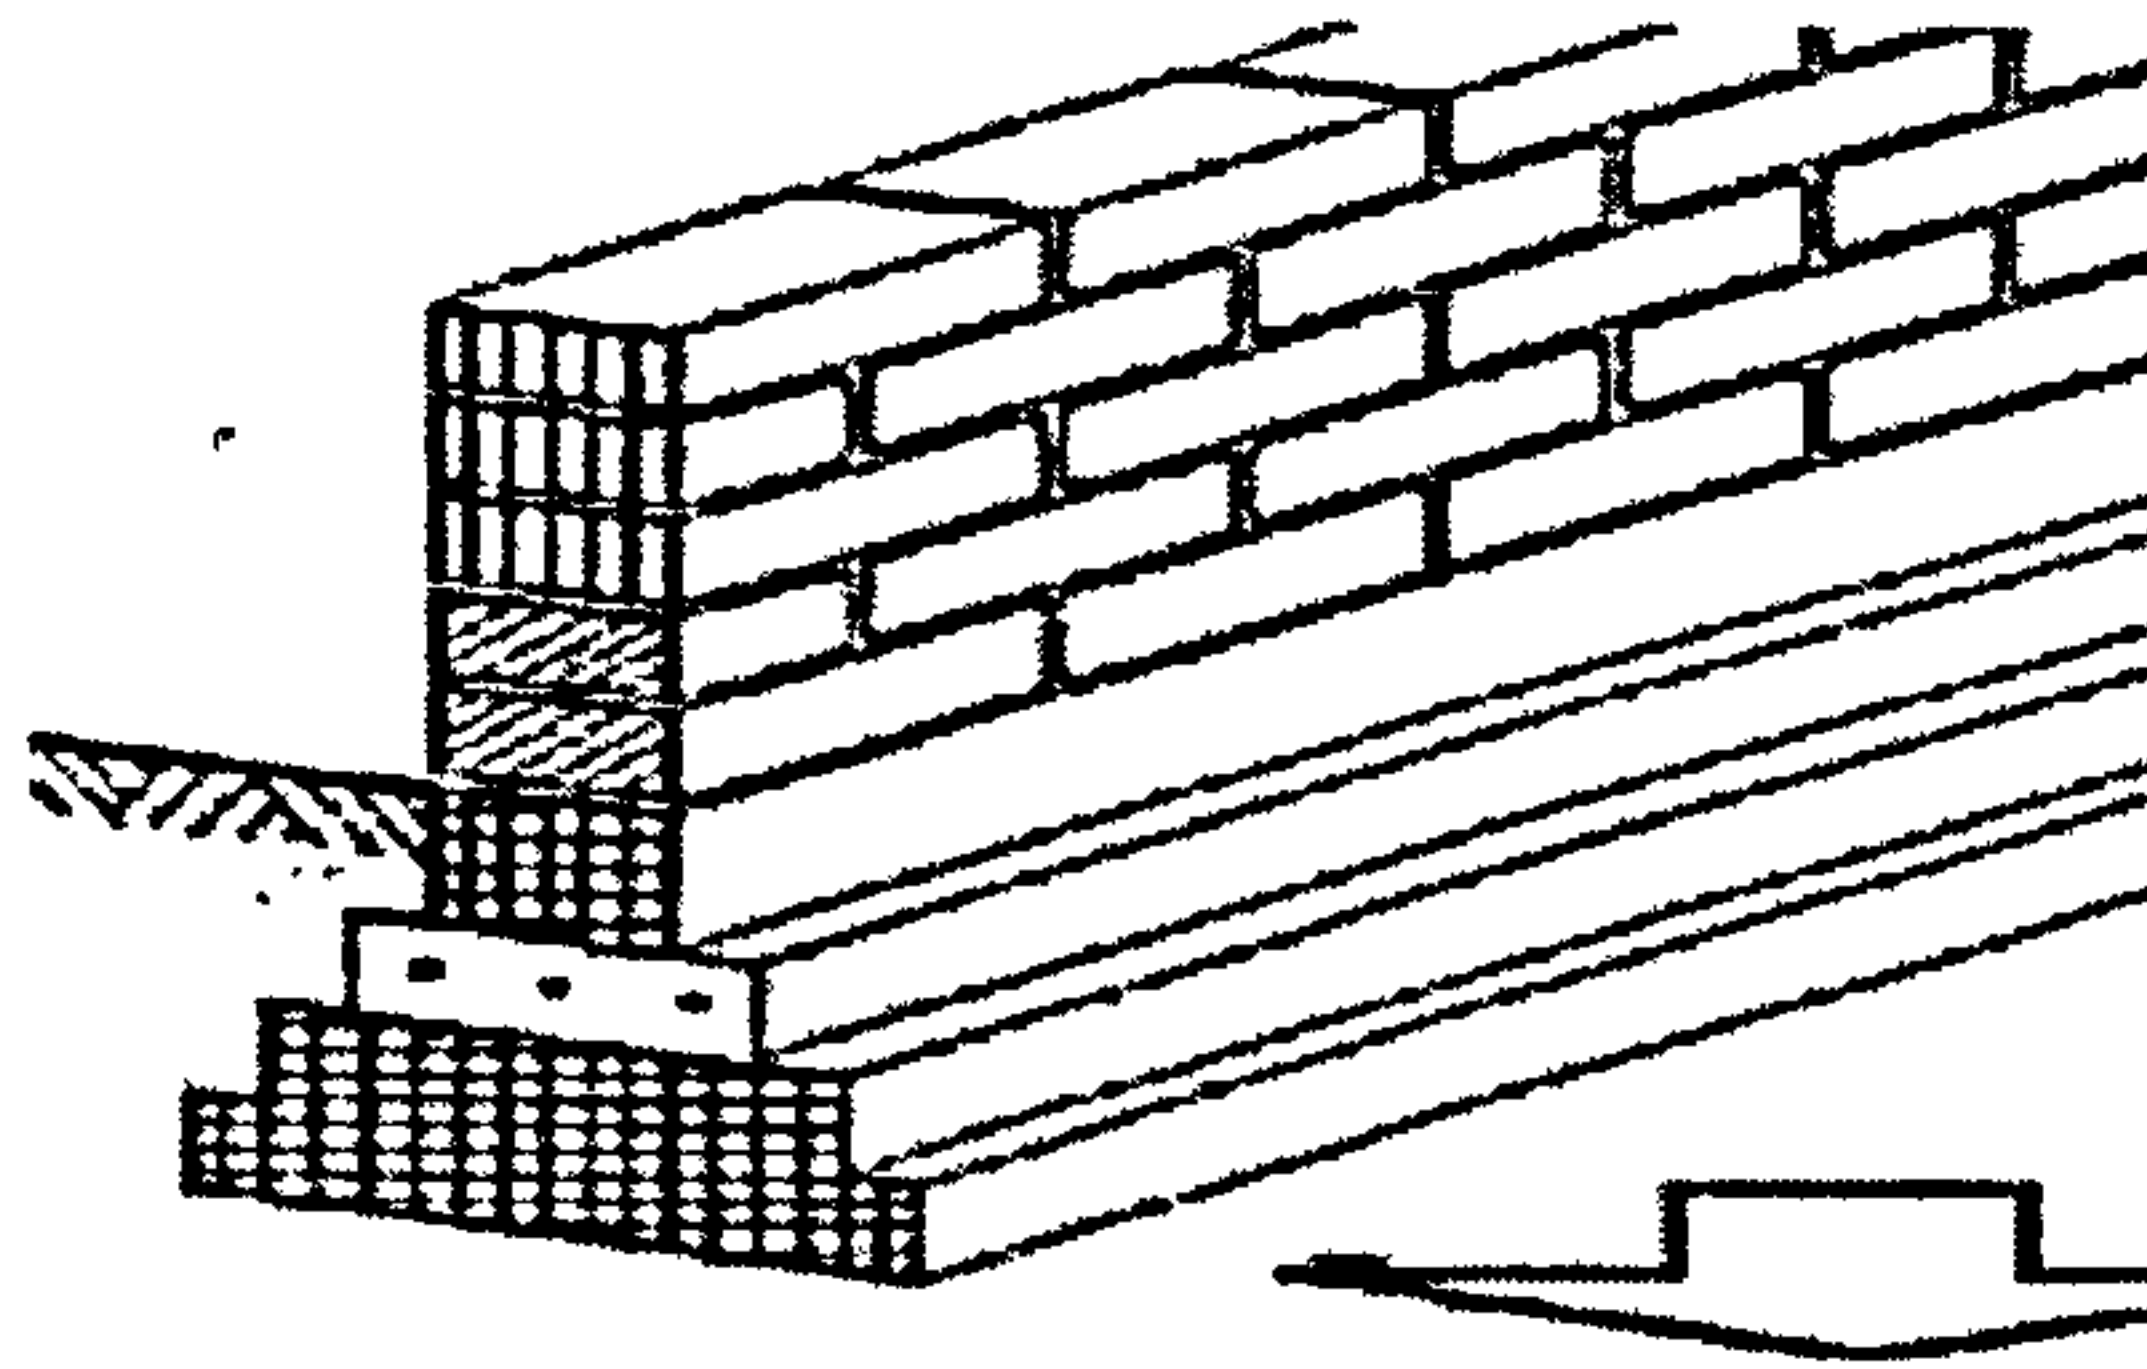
Poor foundation earth (reinforced concrete ground beam has been used) (15)
